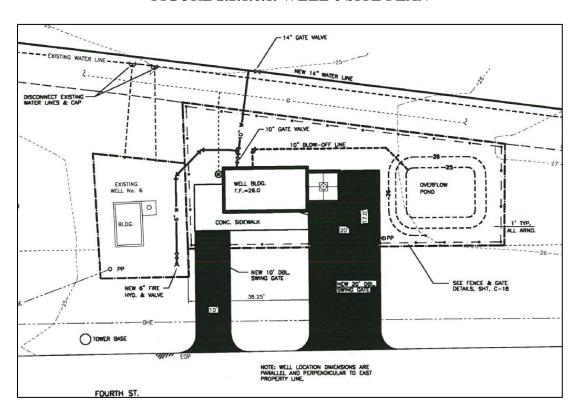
WELL 6 SITE PLAN
